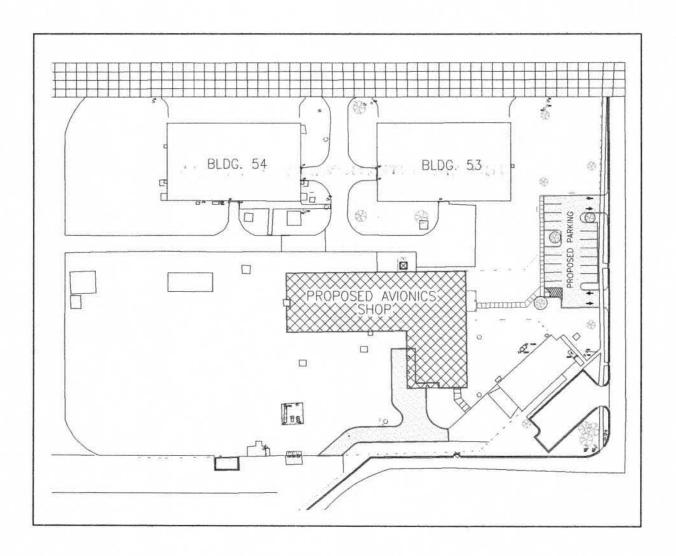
Preliminary Site Plan for the 403rd Avionics Shop Facility
